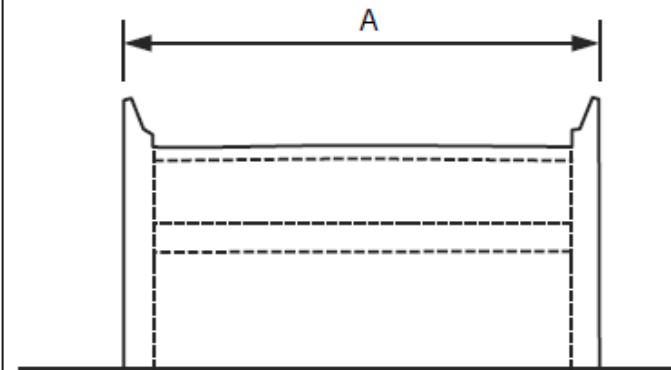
Cross-section view of a filled arch bridge or culvert under fill with headwalls.
